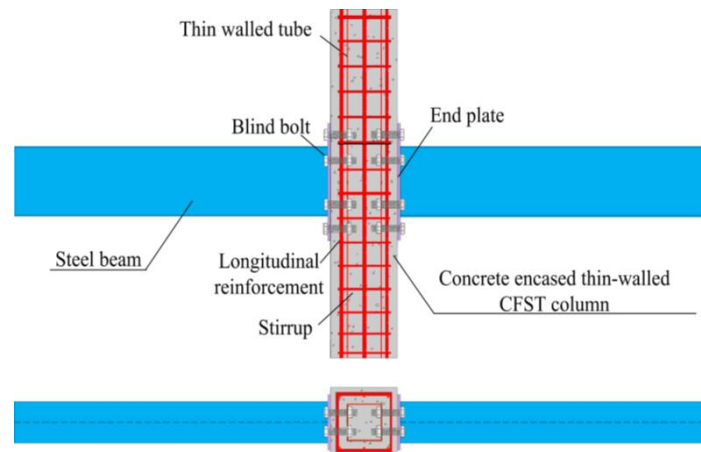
Typical blind bolted connections to CETCFST columns [13].
